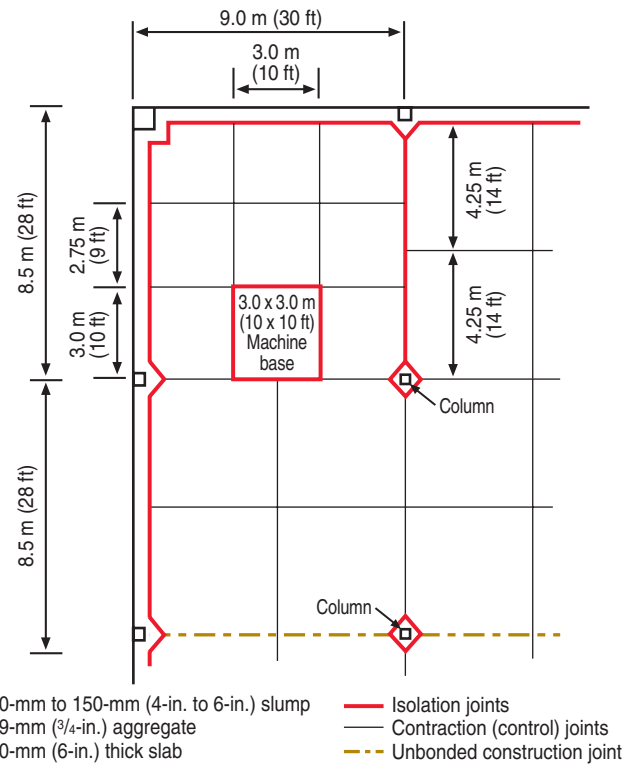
Typical joint layout for a 150-mm (6-in.) thick concrete floor on ground.
